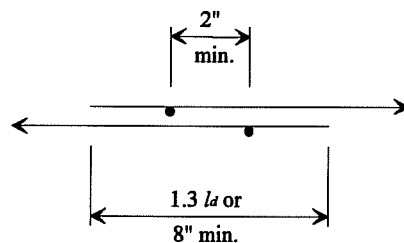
Splice Requirements For Welded Deformed Wire Fabric
